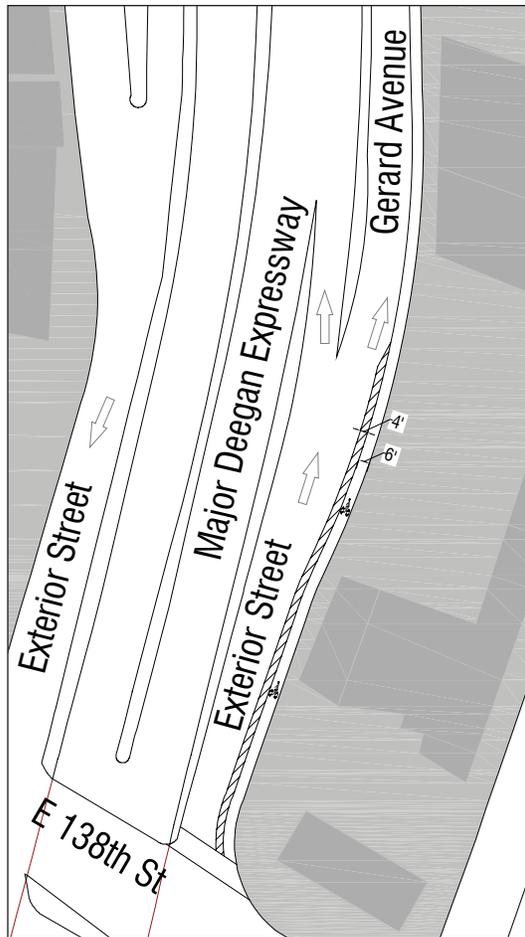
Gerard Avenue between East 140th and East 138th streets, recommended footprint
